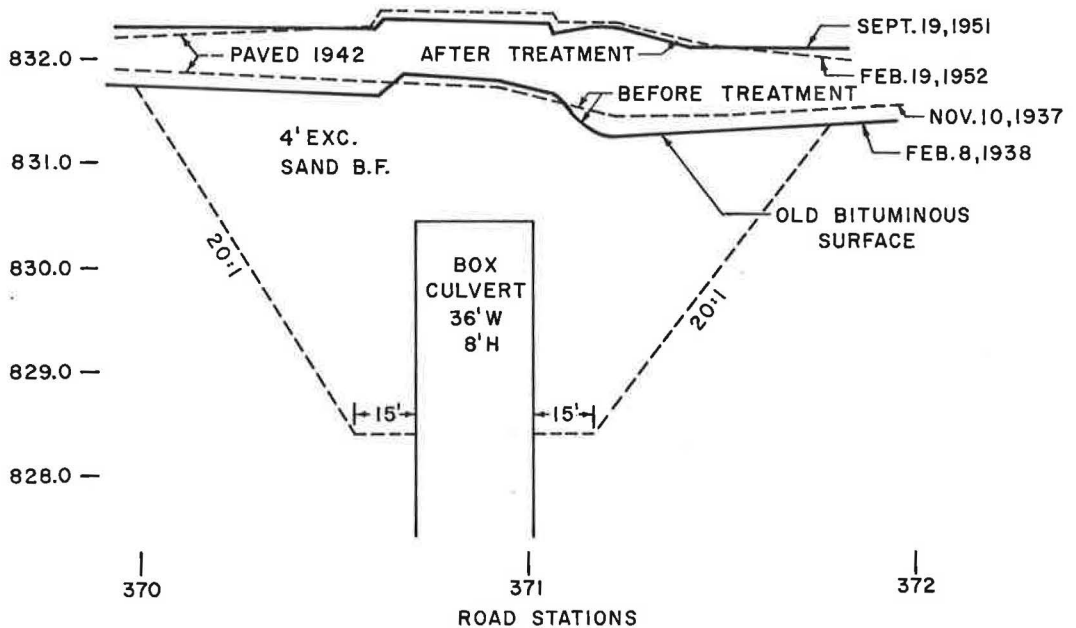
Combination culvert heave and fill shrinkage (low density gumbo clay, northern Minn.).
